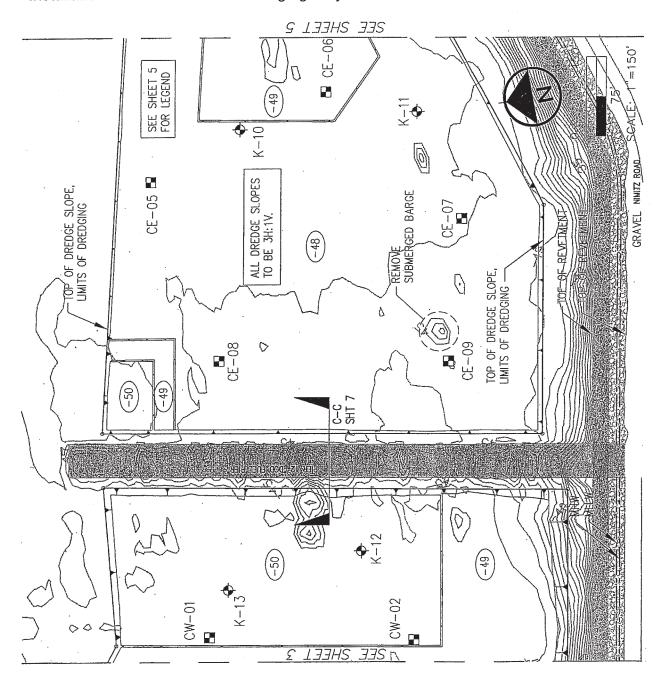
Dredging plan for AOEC-C East and West for IR Site 7.
